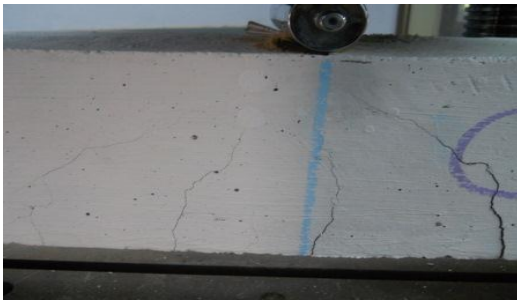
Flexure Failure of over reinforced concrete beam
